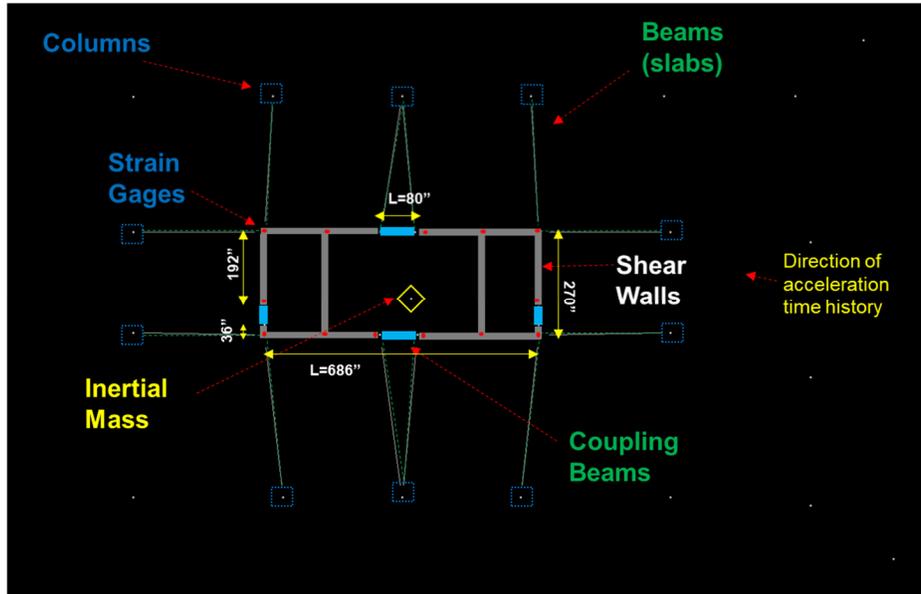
Structural plan view of reinforced concrete shear wall coupled wall system.
